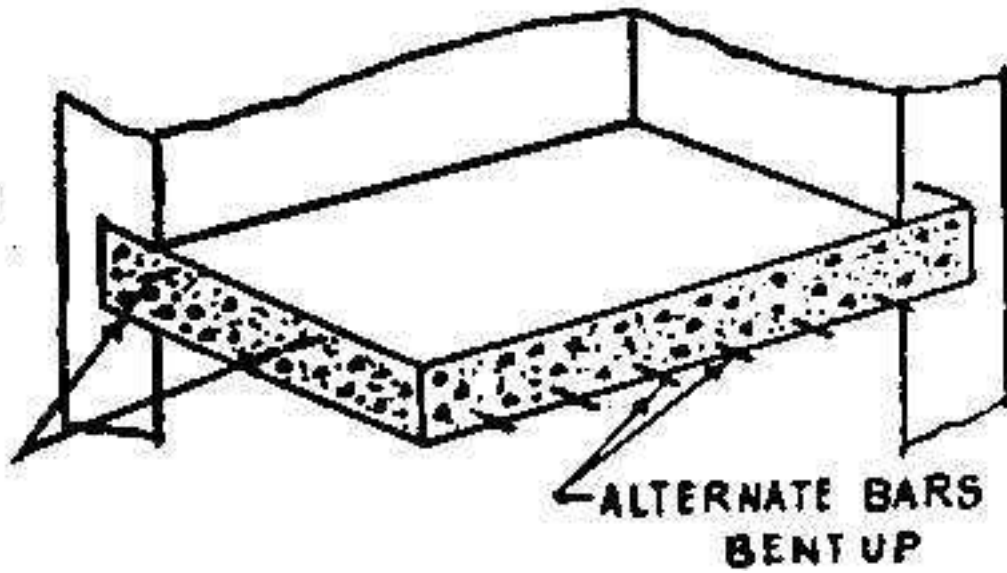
C: Key Structural Details: Wall-Slab Connection (slab may also extend for a full wall thickness)
